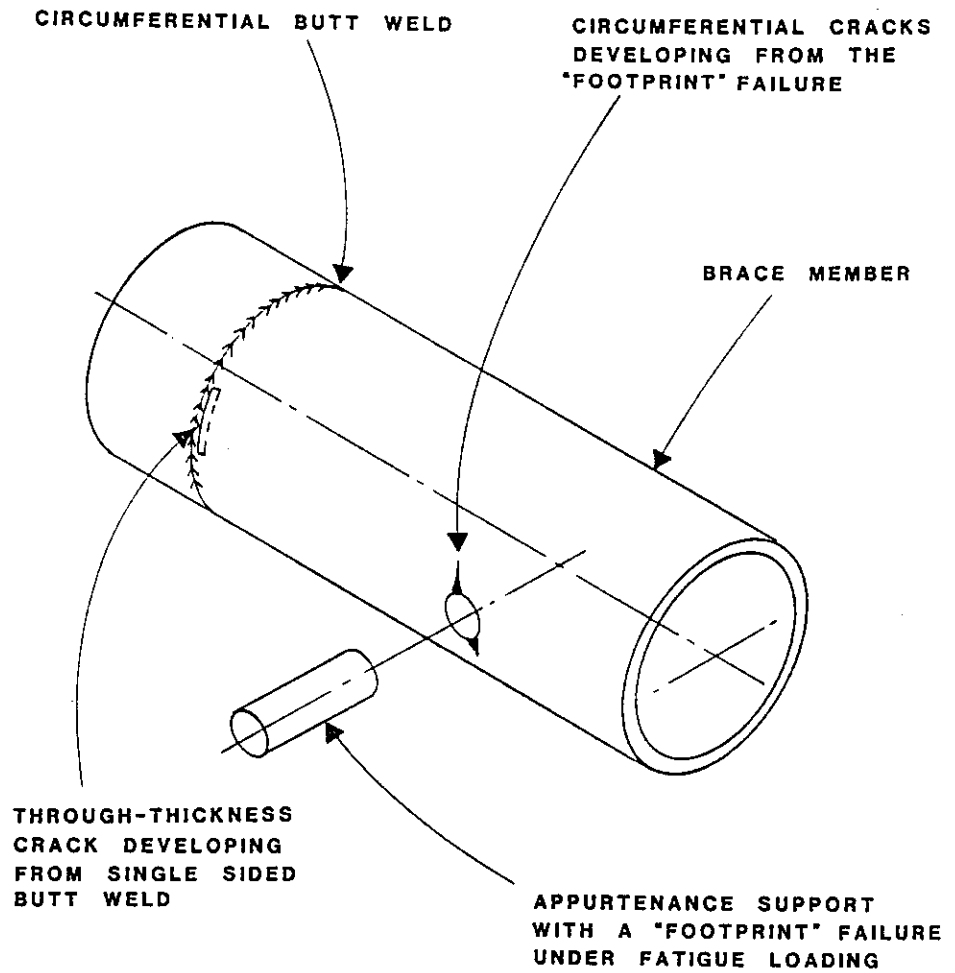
Typical through-thickness crack geometries in a tubular member remote from a joint
